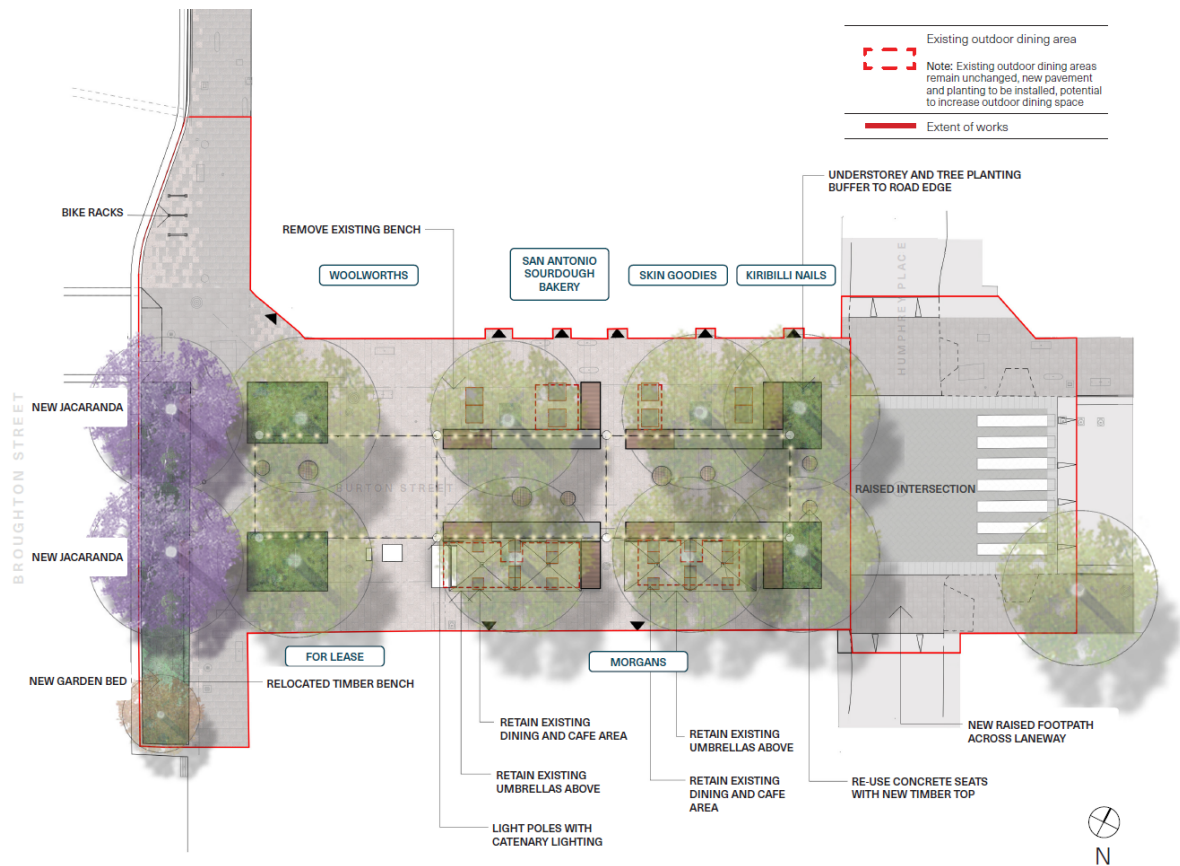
Burton Street Option 1 Layout - Existing levels & no kerbs
